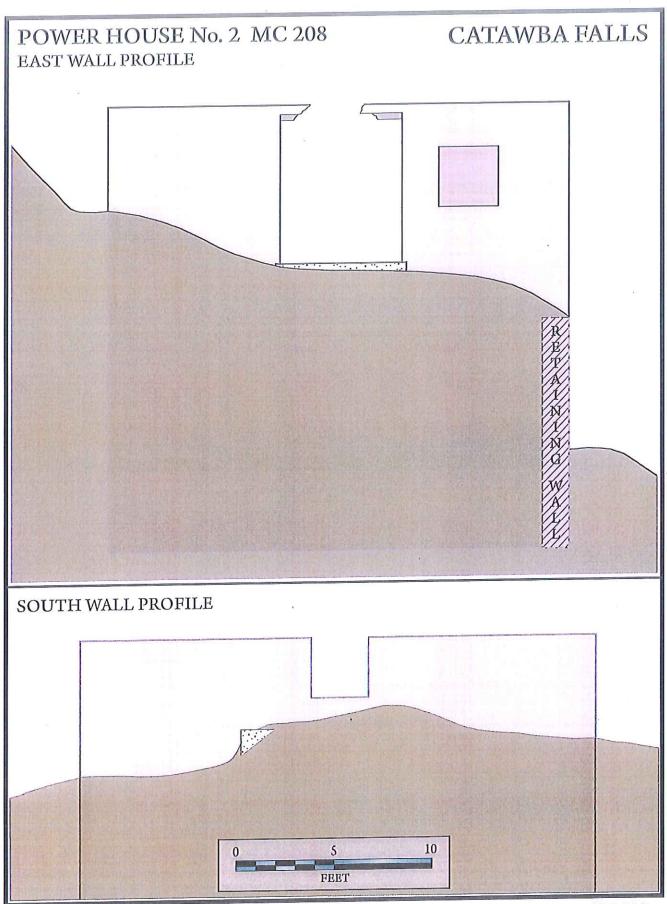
East (top) and south (btm) wall profile drawings of Powerhouse No. 2 at MC 208.
